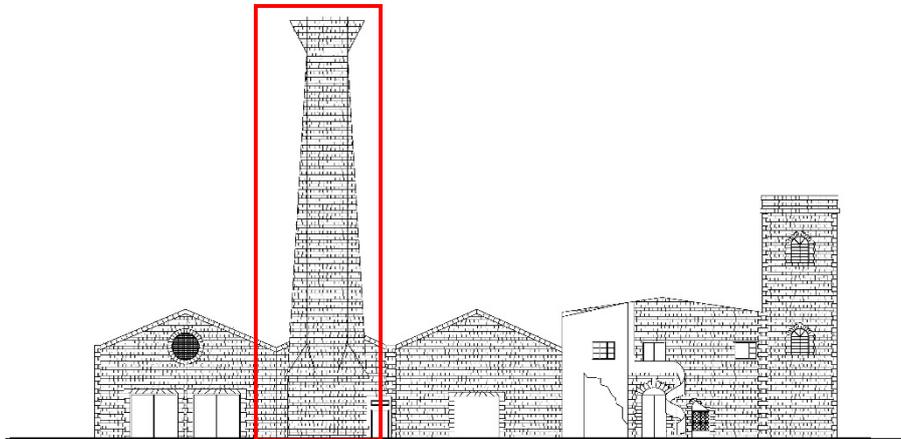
Chimney Tower, North-West Elevation, 15 to 17A Berth, East Wharf, KPT, Karachi.
